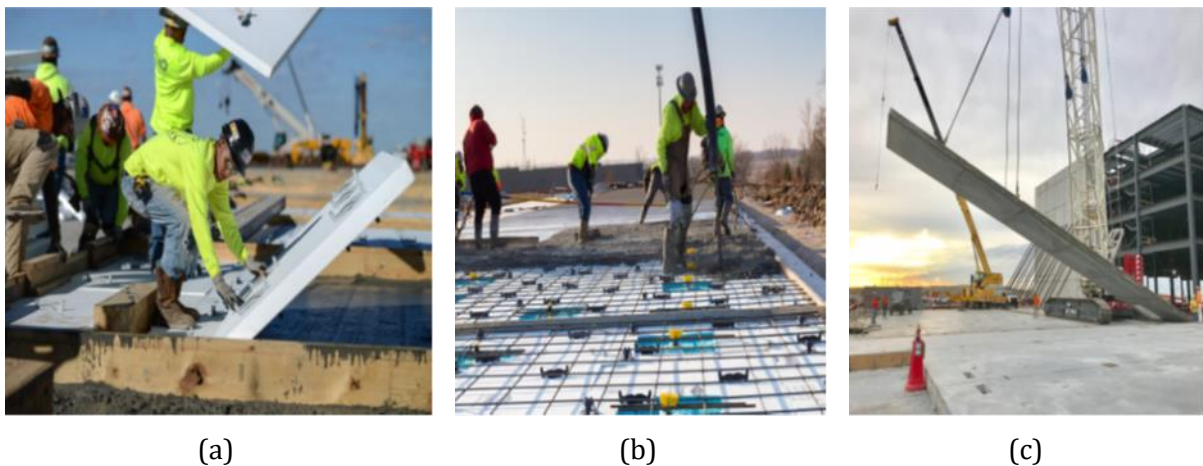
Tilt-up CSWP construction process: (a) workers placing insulation with layer connectors, (b) concrete cast on second layer, (c) erecting the panel in place [31]
